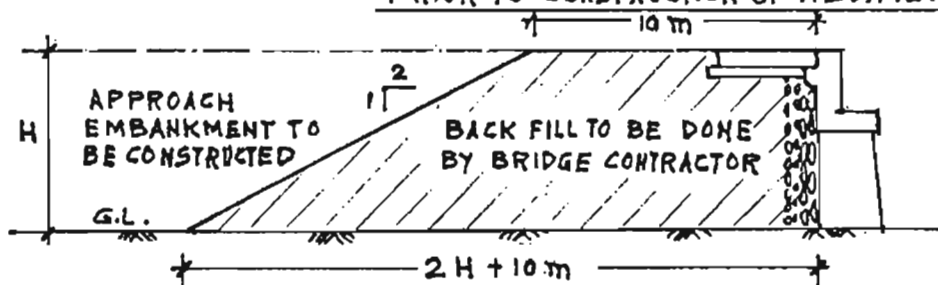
(b) CASE-II ABUTMENT CONSTRUCTED PRIOR TO CONSTRUCTION OF APPROACH EMBANKMENT.
